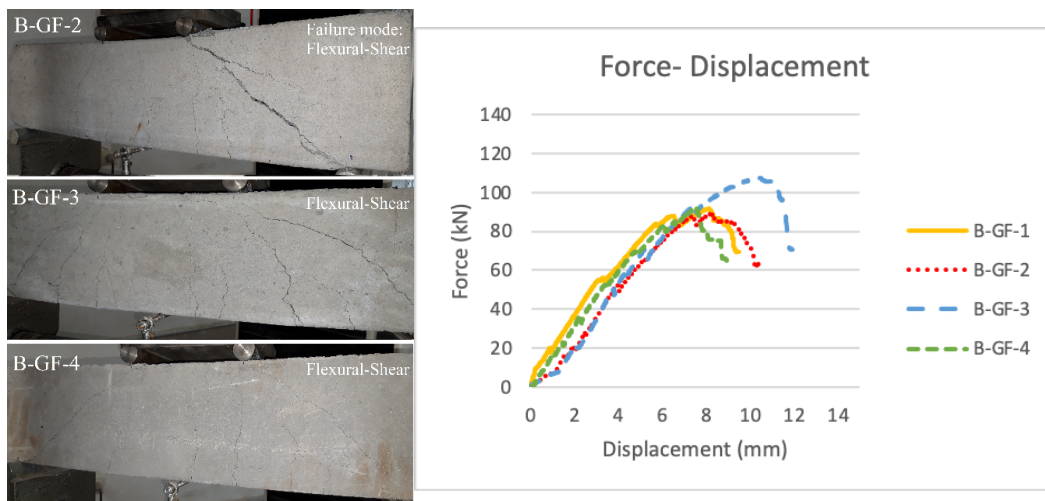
Beams reinforced with GFRP rebars with concrete mixing plans 2, 3, and 4 under bending test.
